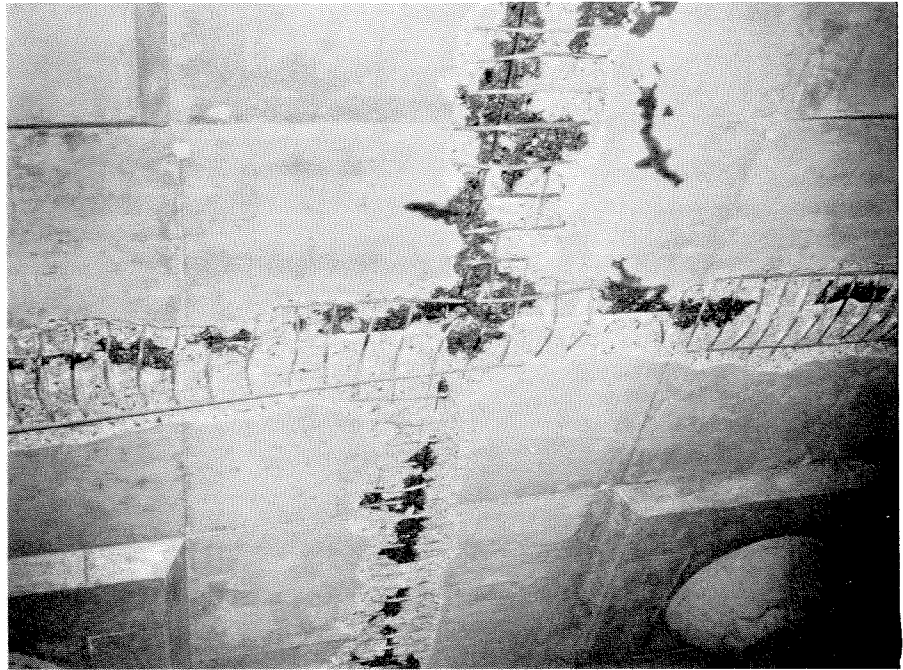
Typical damage to roof slab along construction joints. (MWD photograph).
